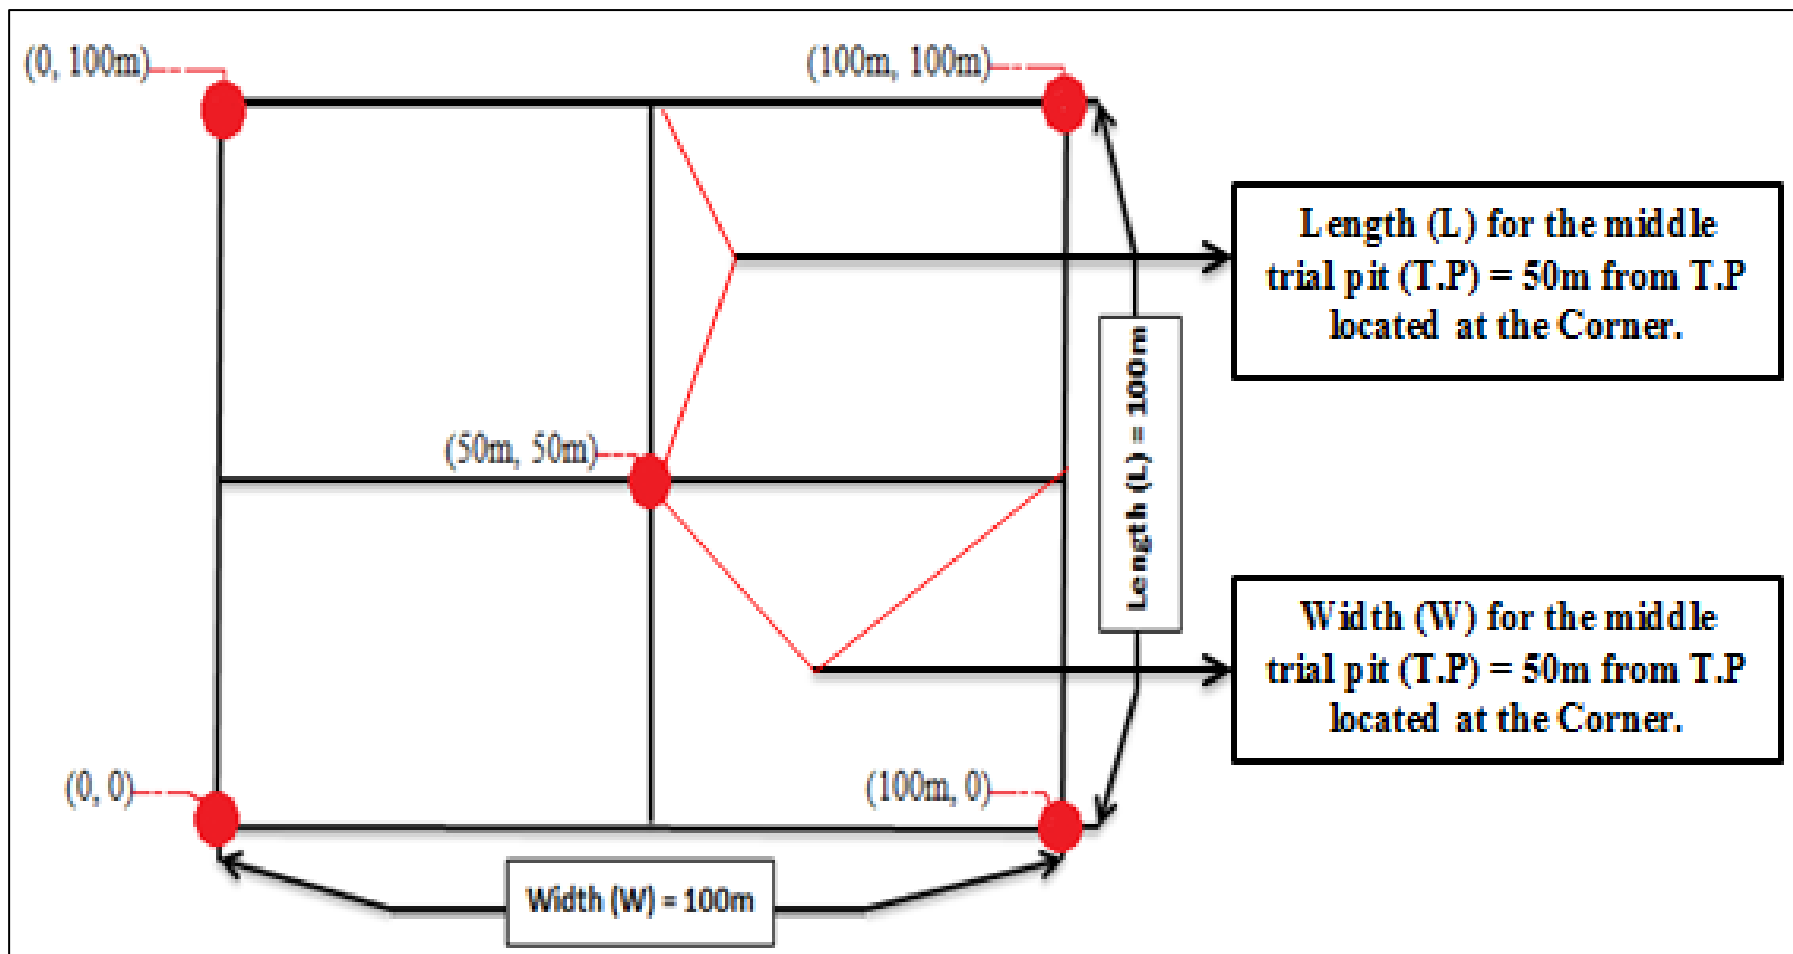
Top view plan of Trial Pits (T.Ps) locations for soil samples at potentially non-contaminated site in Greater Burgan Oil Field (Al-Magwa area).
